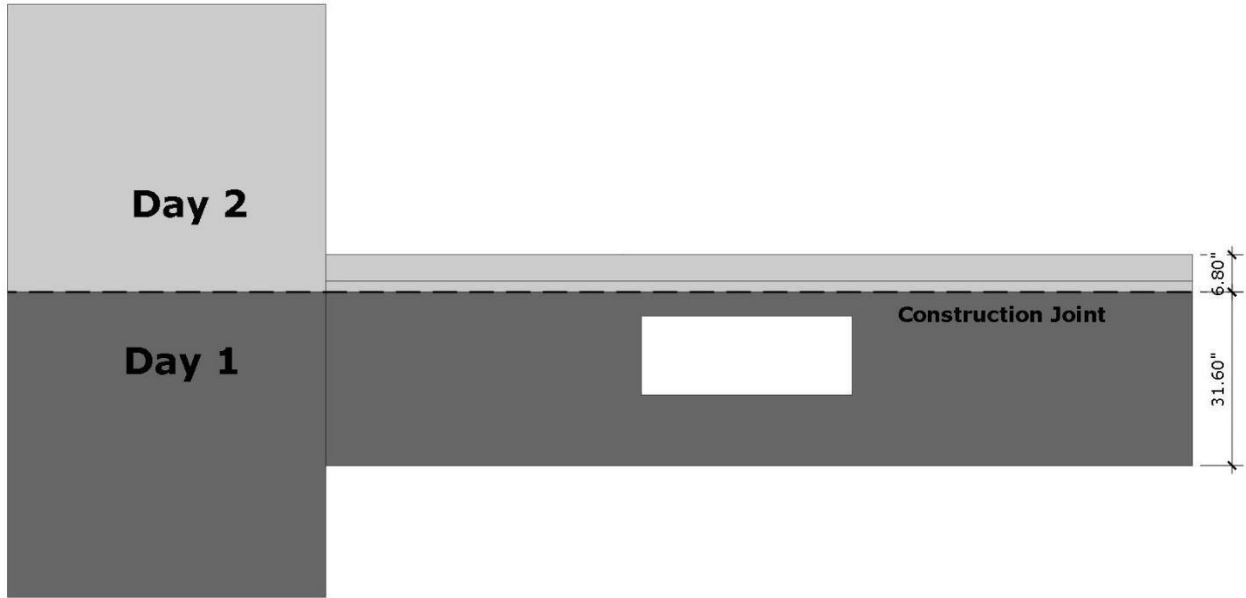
Schematic showing typical concrete pouring schedule with construction joint
